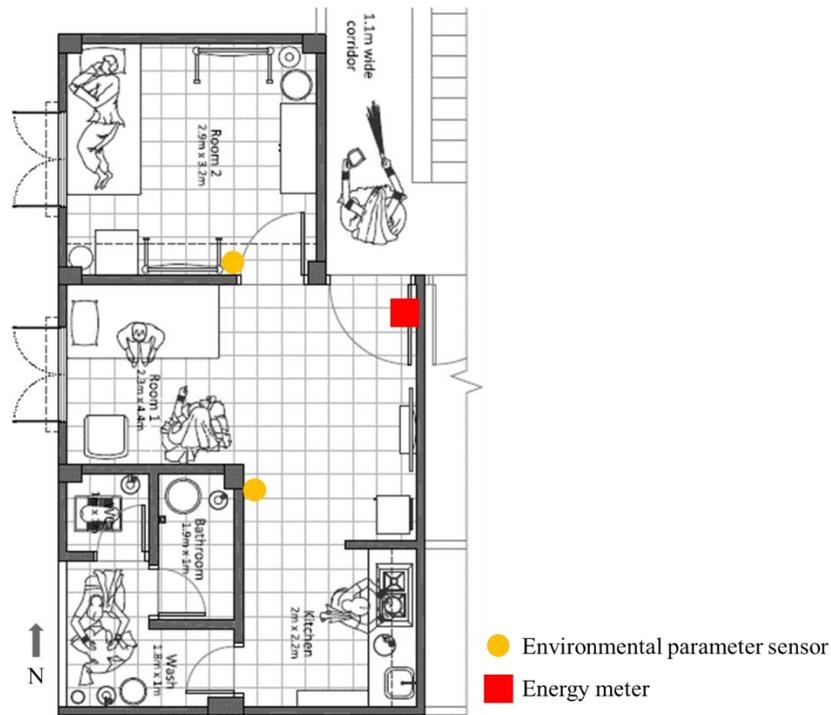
Monitoring equipment installation location on typical floor plan of affordable dwelling unit
